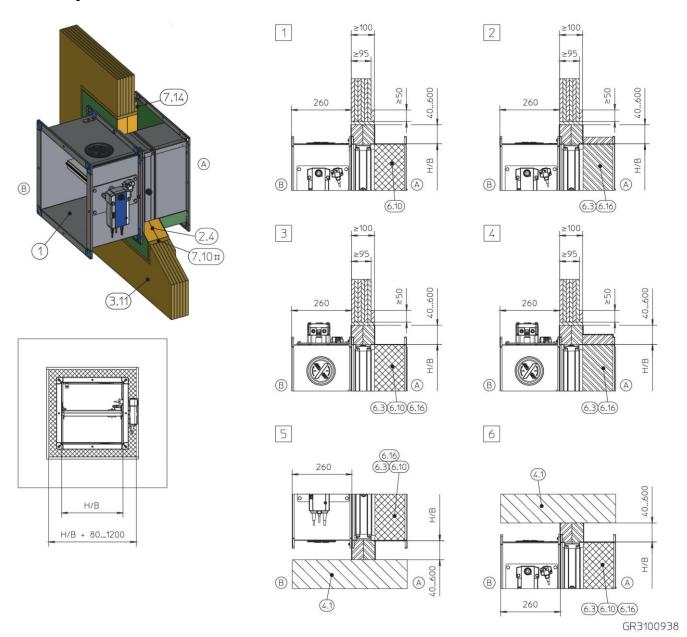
Dry mortarless installation into a timber wall or CLT wall, with a fire batt
